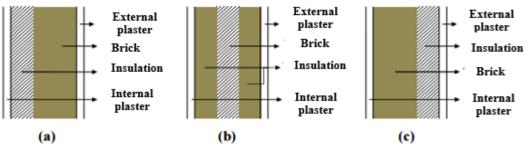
Types of Insulation Applied to Walls: (a) Internal Wall (b) Sandwich Wall (c) External Wall
